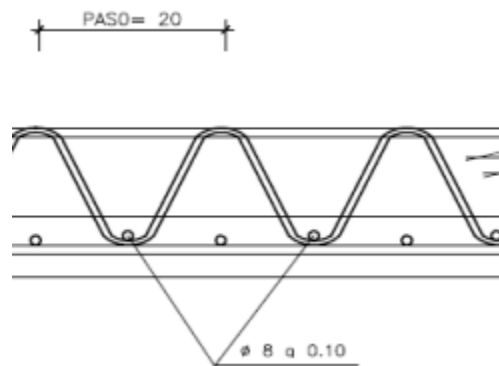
Longitudinal PCP reinforcement spacing (courtesy of Bridges and Roads, LLC.)
